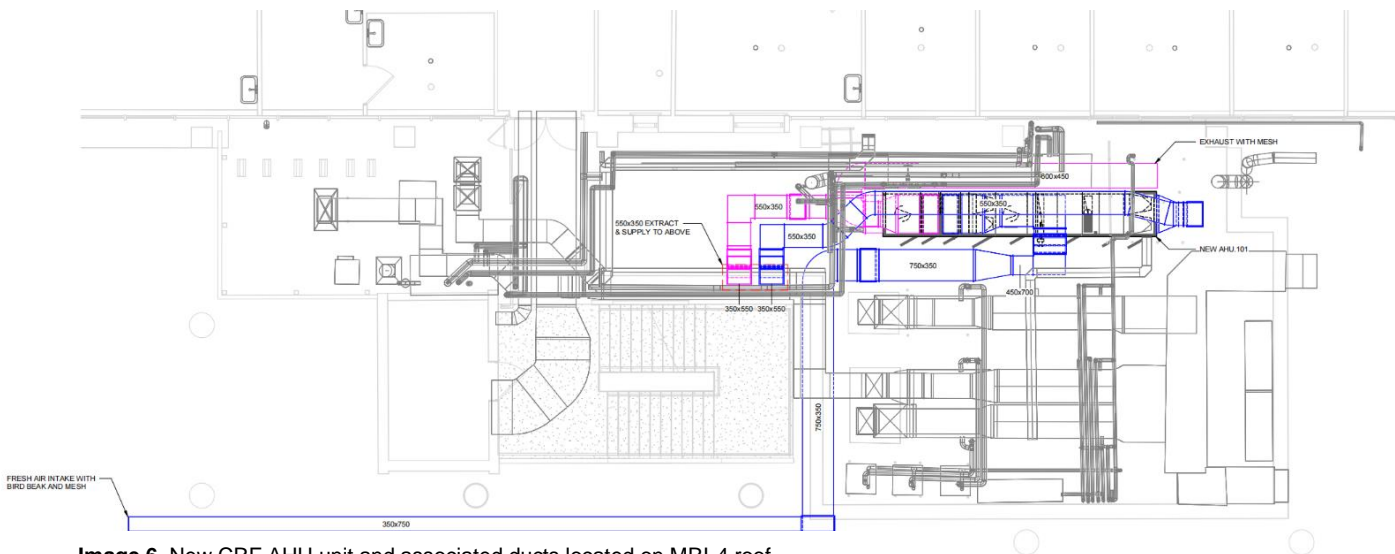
New CRF AHU unit and associated ducts located on MRI-4 roof
